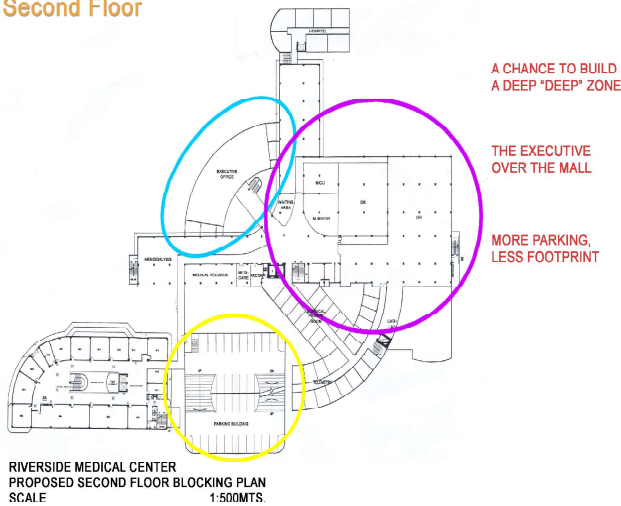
Features of the Proposed Blocking Plan - Second Floor
